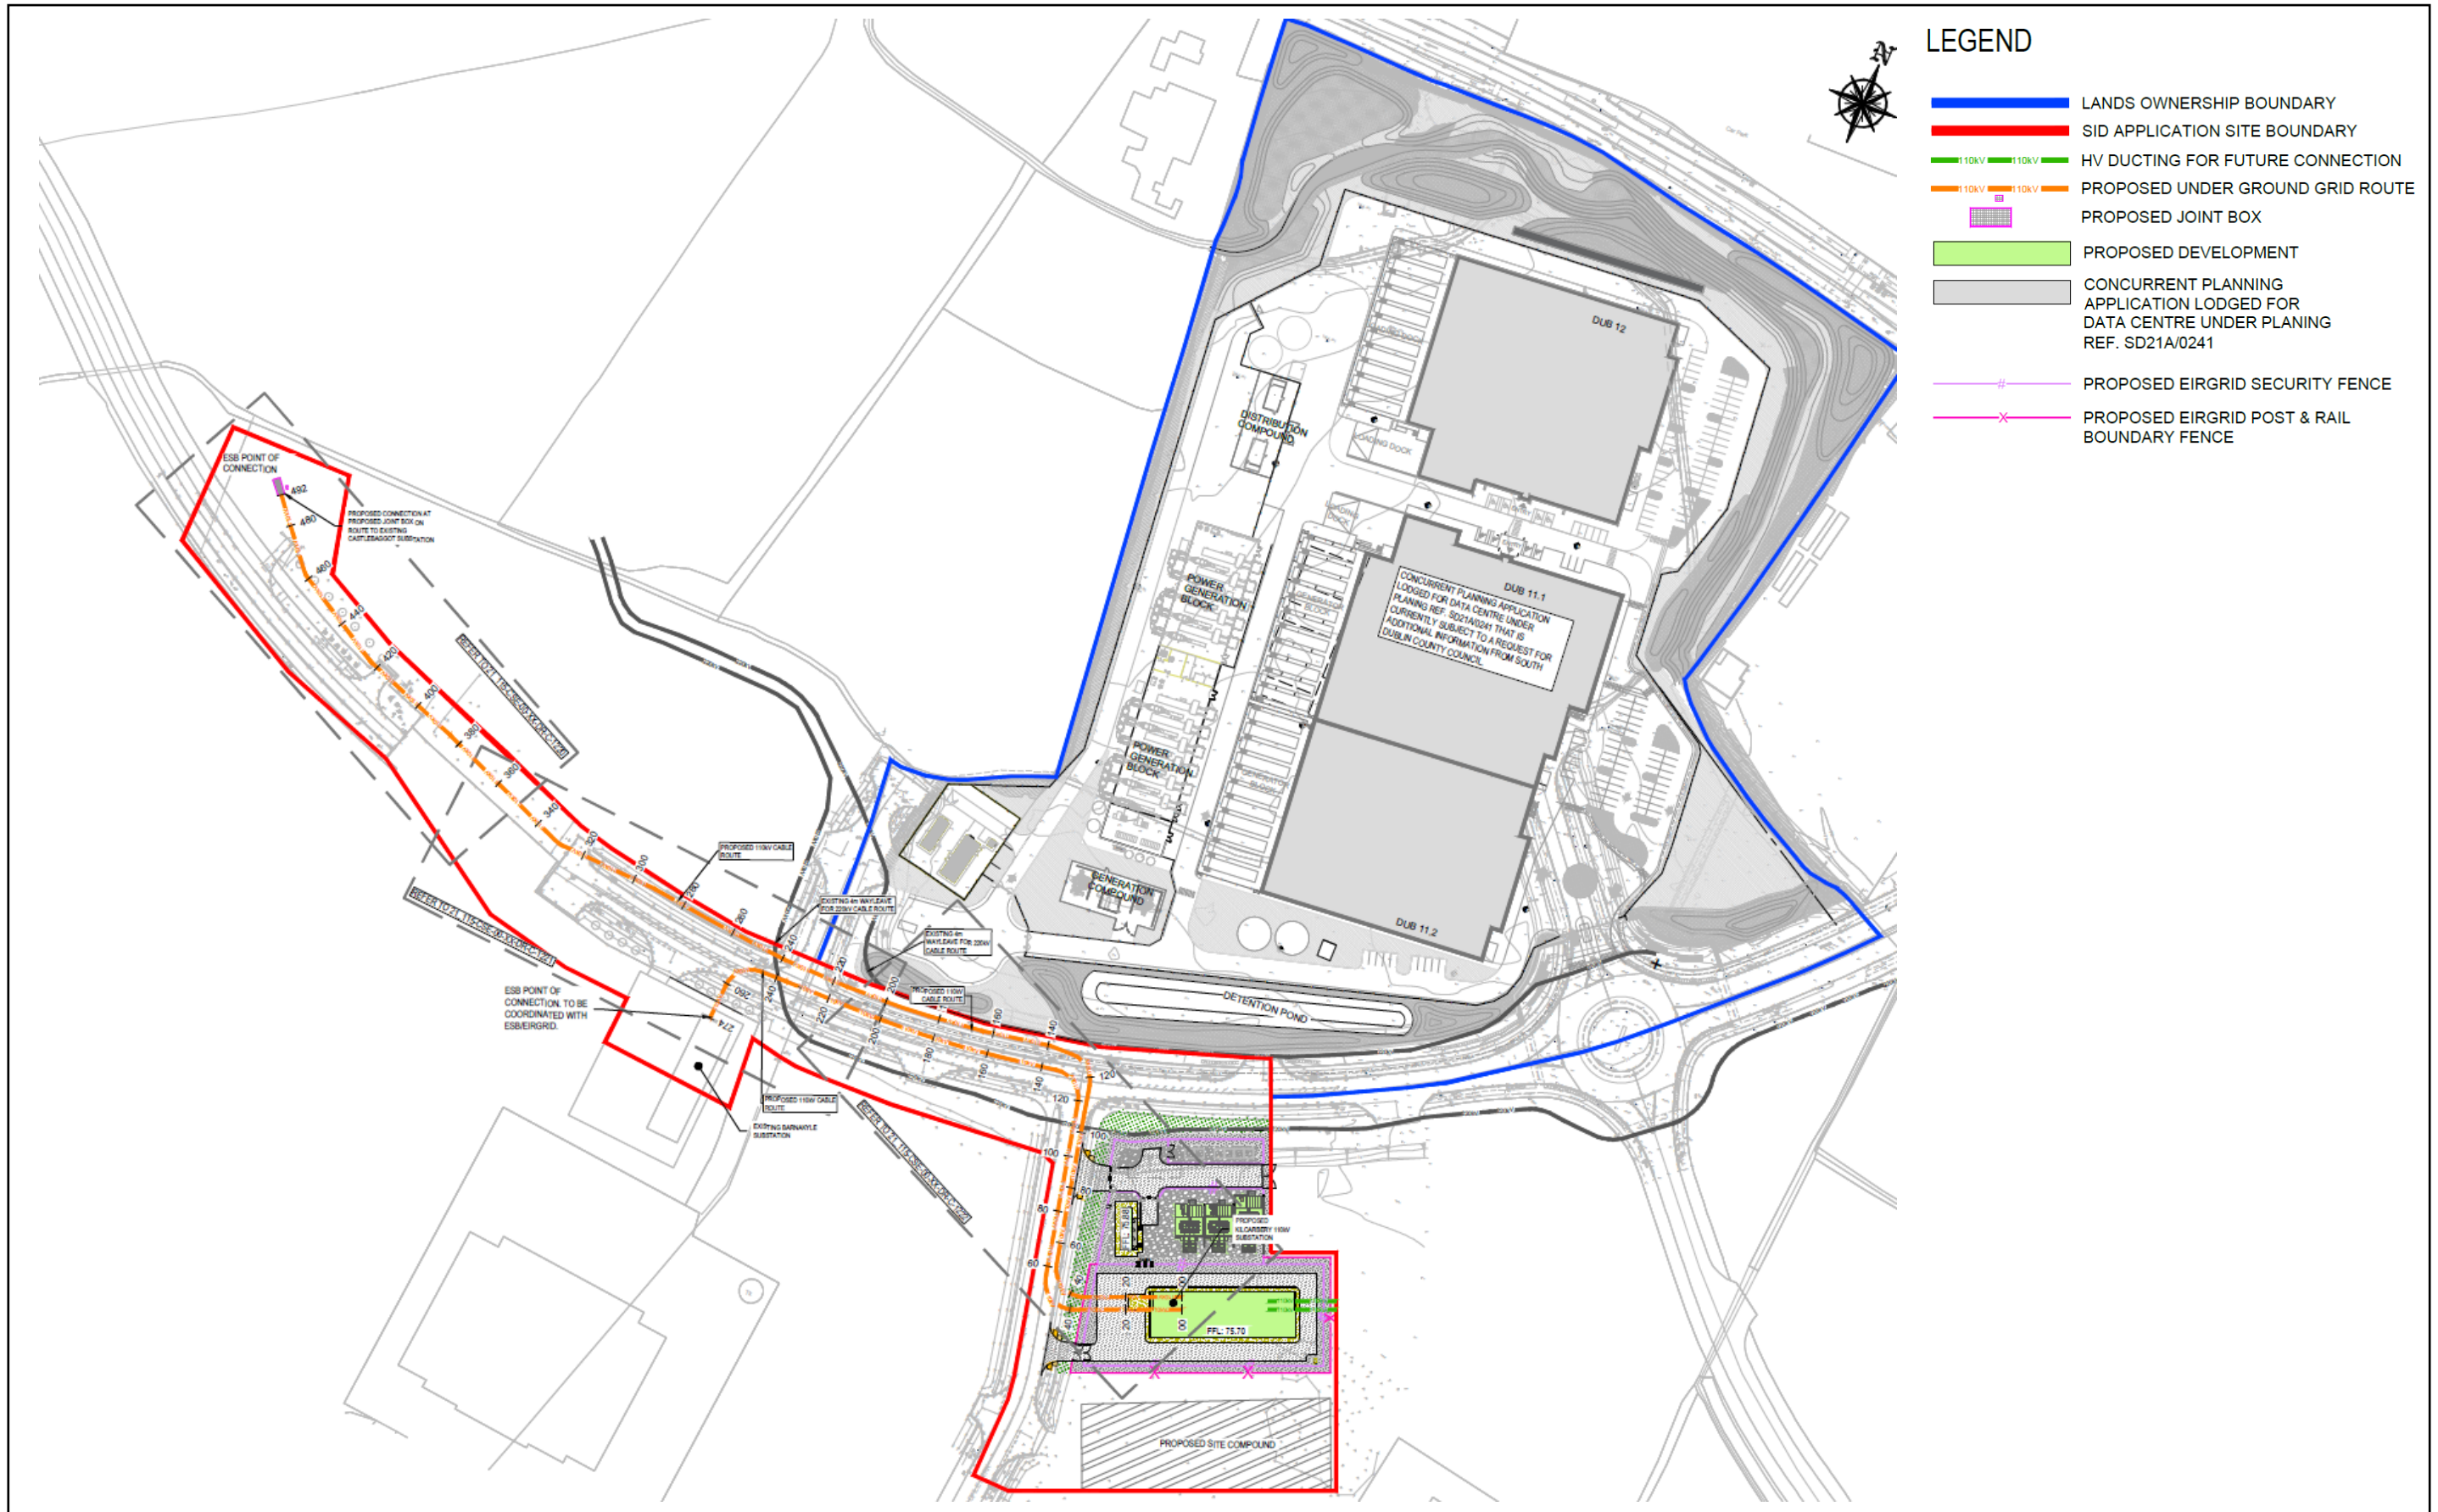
Proposed Overall Route Layout Plan (Source CSEA)
